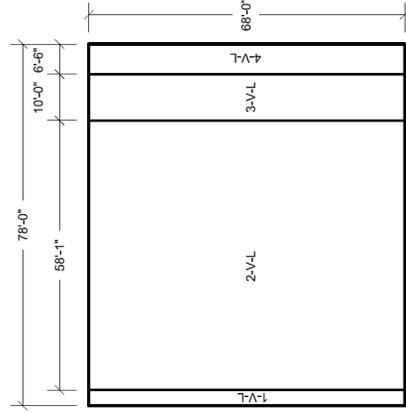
H.6-66: PUMP HOUSE WEST WALL LOOKING EAST
